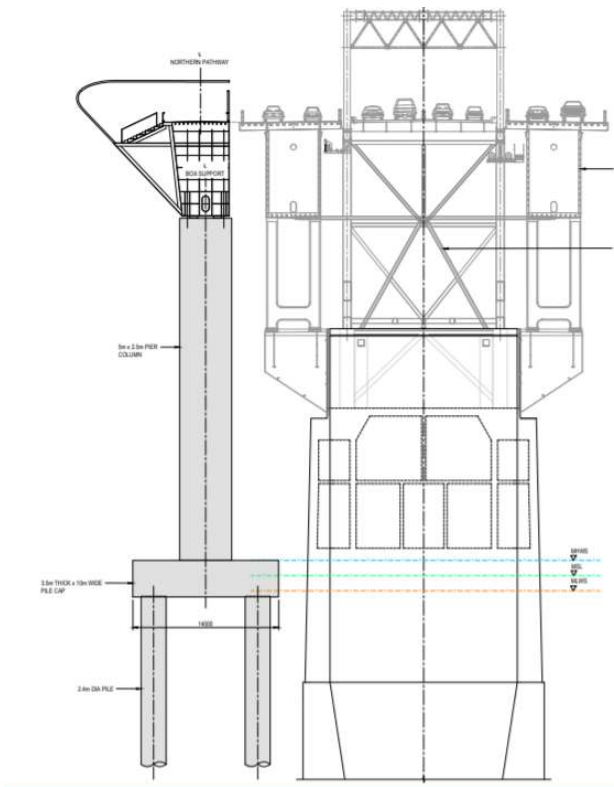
Cross-section sketch of Pier 2 showing the concept for an independent substructure option
